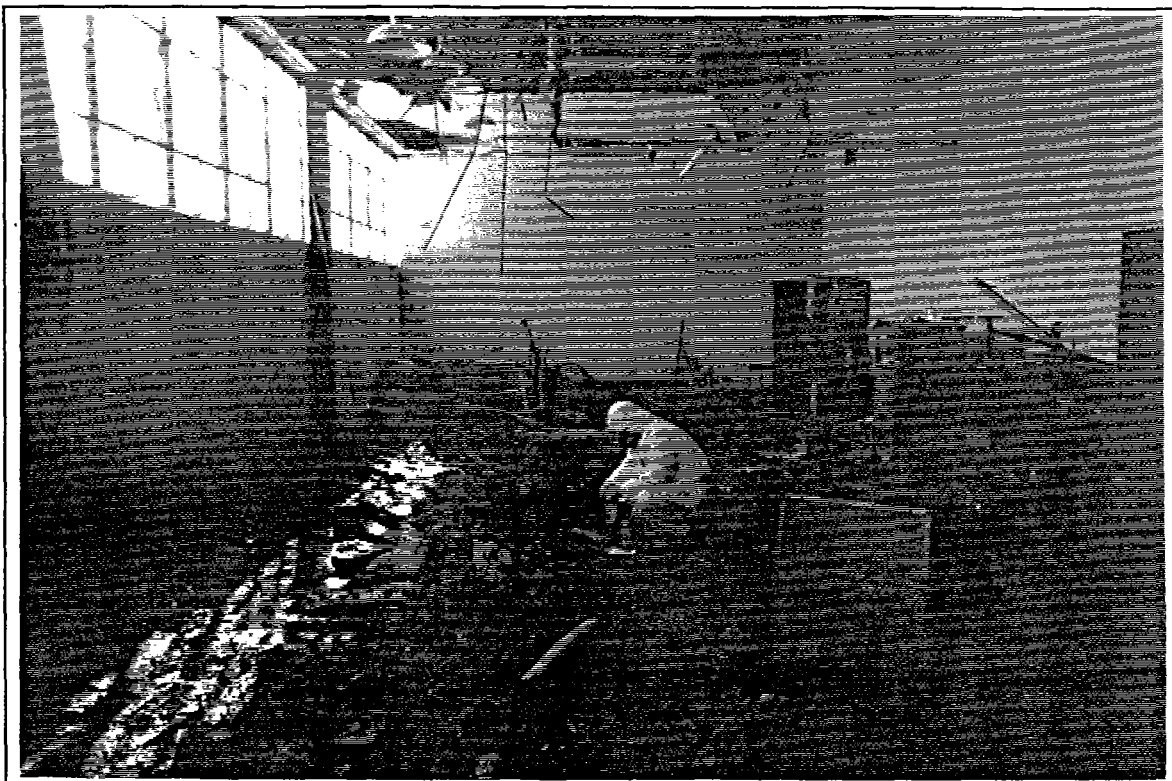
Building 41 - East side of building where water intrusion has caused collapse of non-asbestos plaster ceiling (Sample No. 1-029), non-asbestos concrete roof panels (Sample No. 1-030), and non-asbestos roof flashing material (Sample No. 1-031)
